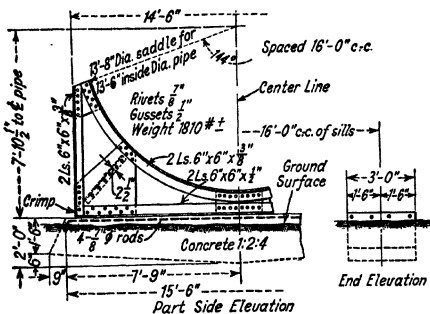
Saddle and Sill Details for 13-ft. 6-in. Diameter Steel Pipe.
